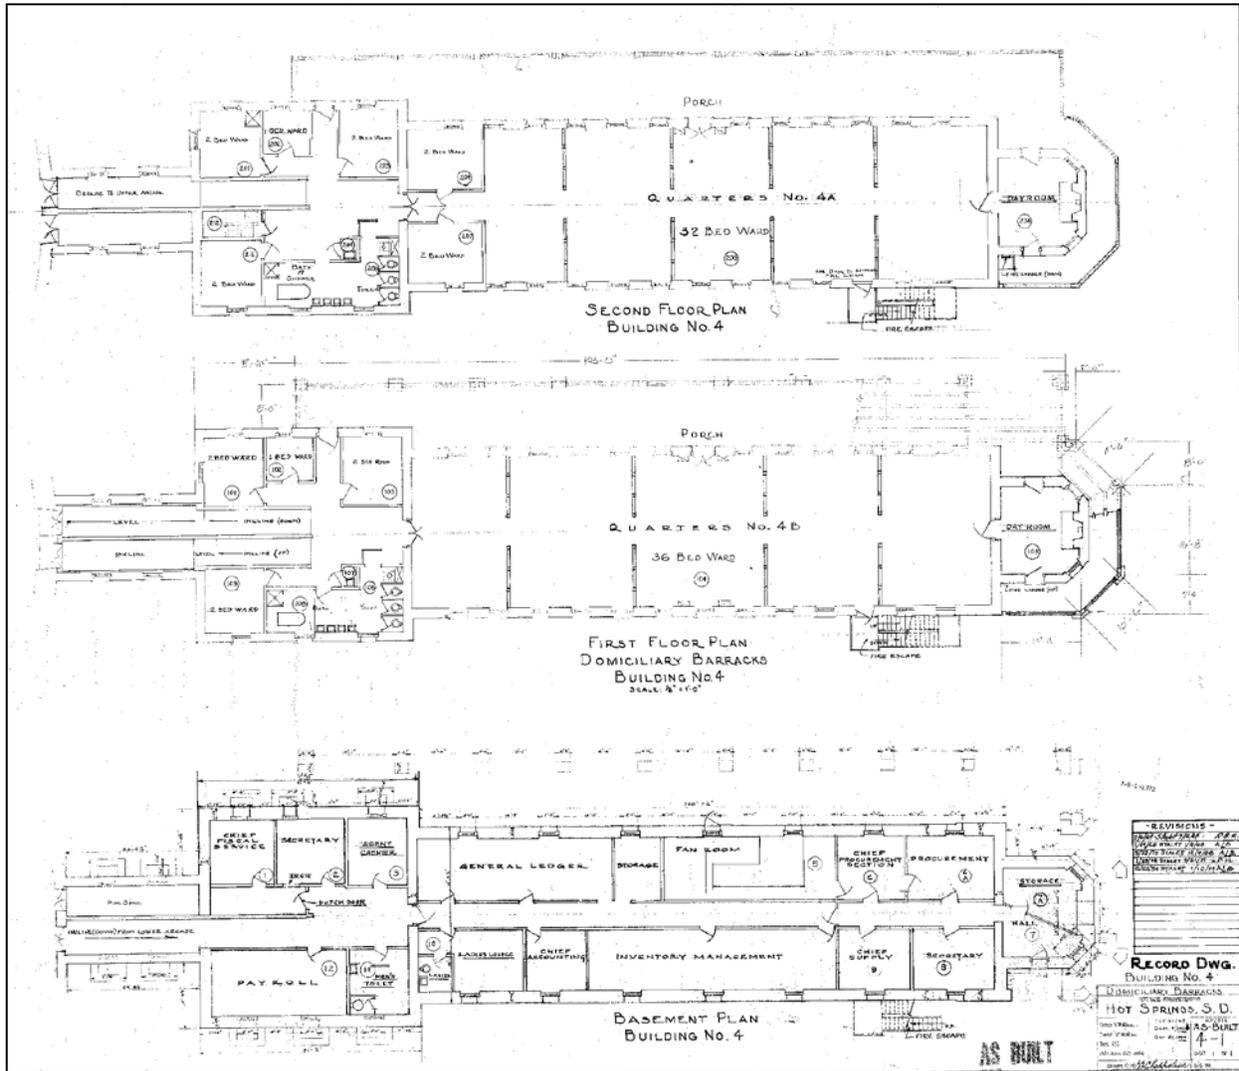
Building No. 4 Floor Plans, (20 August 1952)
